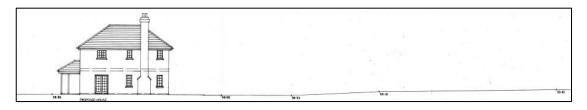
Proposed Cherry Tree Lane Street Elevation
